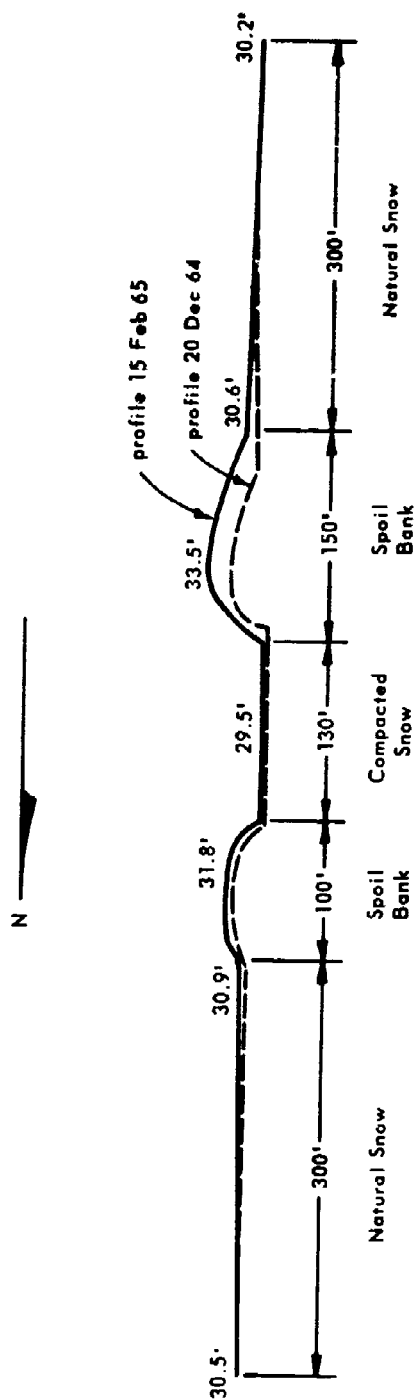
Cross section of 10-70 test area at Station 60+00 on 15 February 1965.
